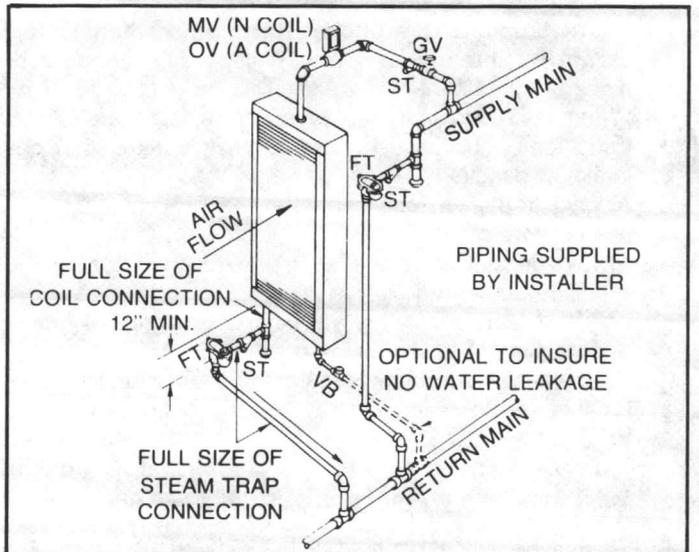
Typical Piping for Type NS Steam Coils and Vertical Tubes for Vertical Airflow
